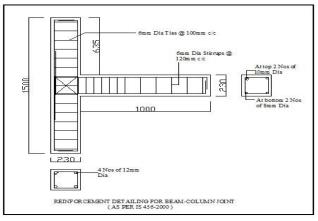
Reinforcement Detailing as per IS 456 : 2000
